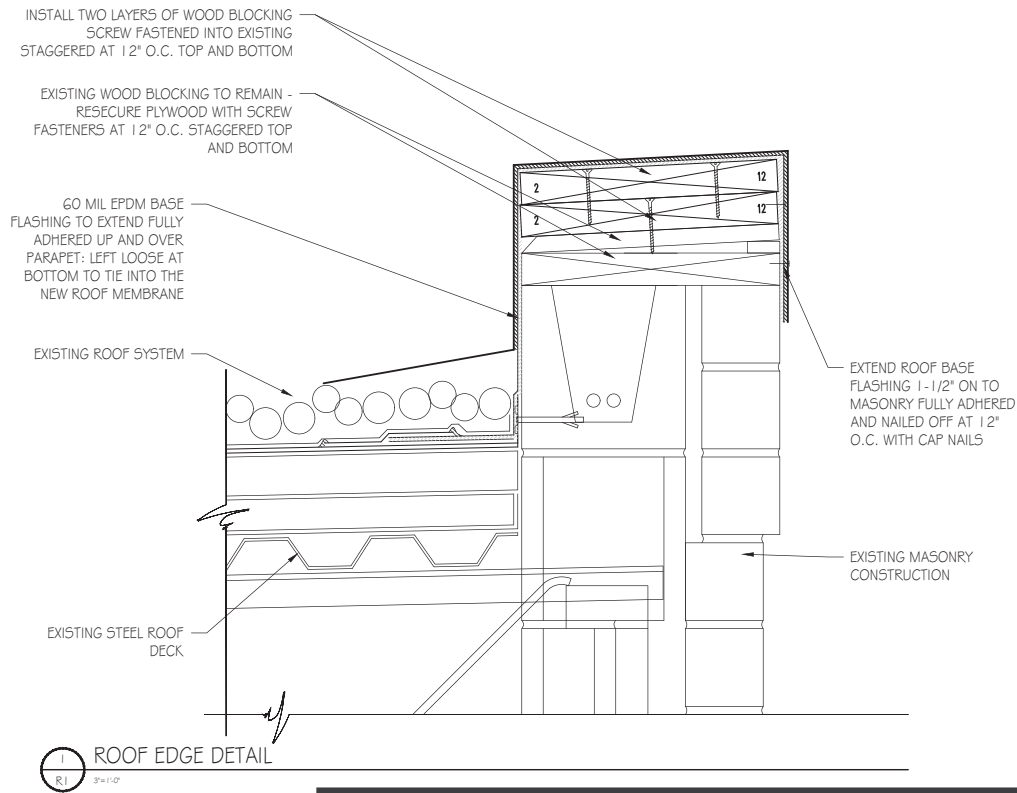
This detail reflects the phased approach of installing all the wood blocking prior to the installation of the new roof system.
